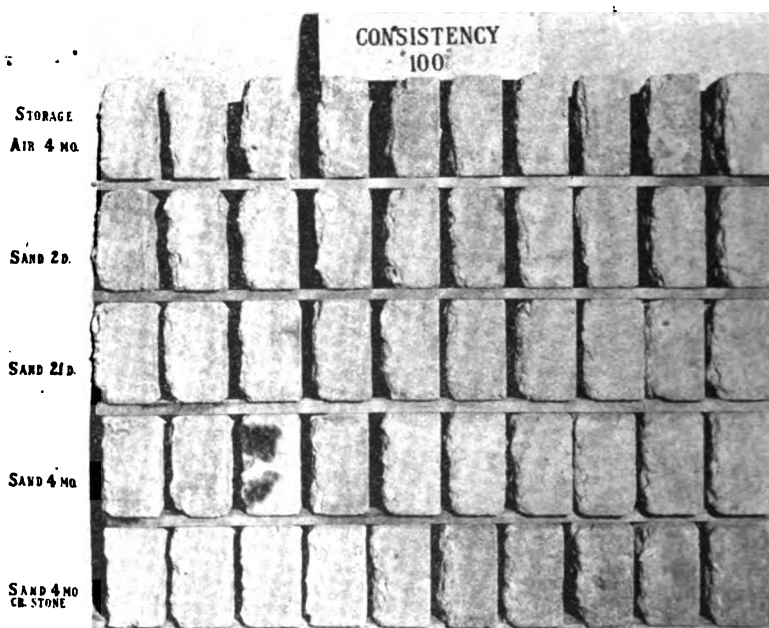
SIDE VIEW OF WEAR BLOCKS AFTER TEST.
